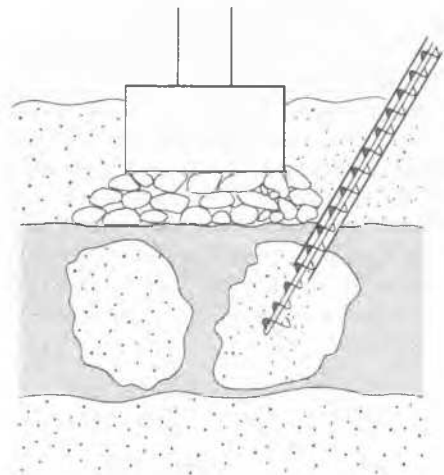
Ground improvement by stuffing in the vicinity of shallow foundations of historical buildings
